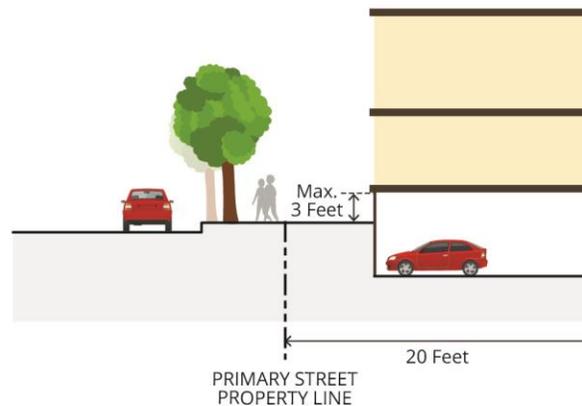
H UNDERGROUND AND TUCK UNDER PARKING, MAXIMUM ABOVE GROUND HEIGHT
